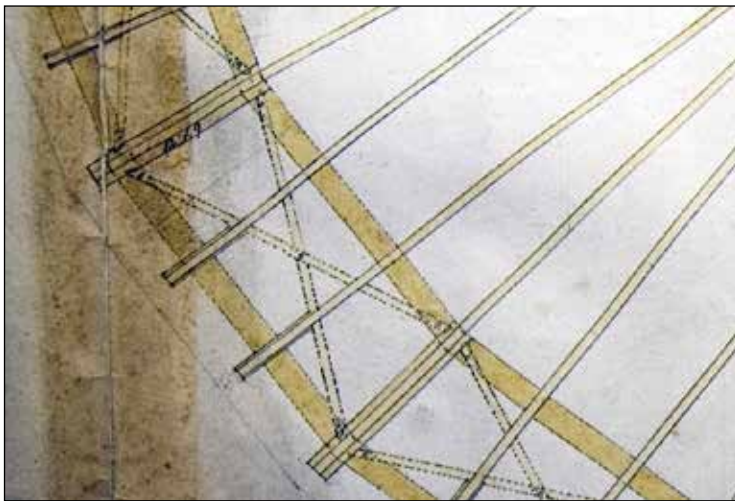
Detail of the 1814 roof plan of the Rotunda (see Fig. 11), showing the triangularly braced double wall plate. (The National Archives, ref. WORK 43/574)
